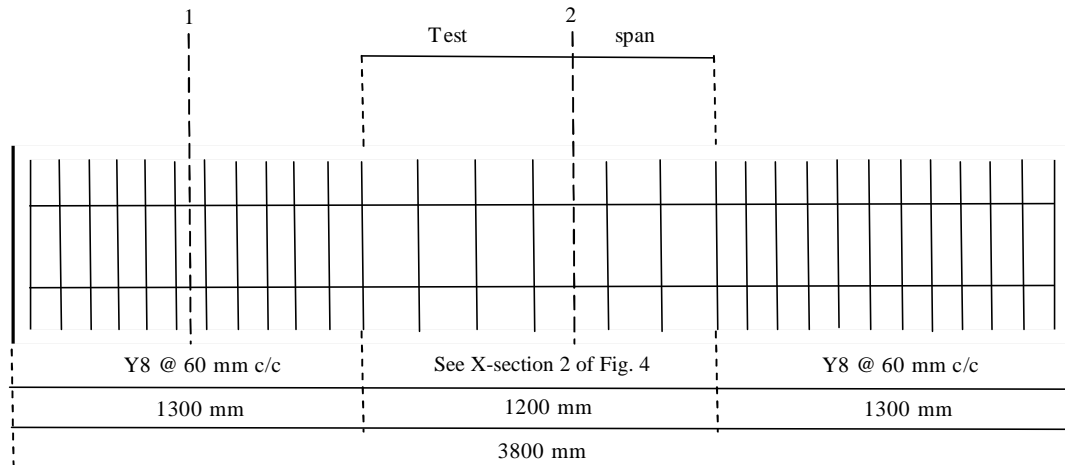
shows typical arrangement of reinforcement and Fig. 4 shows the provided reinforcement and arrangement of longitudinal bars for each beam. The solid circles in Fig. 4 represent the longitudinal bars or pre-stressing wires in which strain was measured nearest to mid-span. Strains in the stirrups nearest to mid-span on the front and rear faces were also reported.
